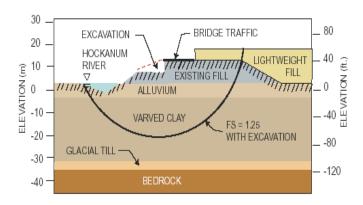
Slope stability for east abutment. Final conditions with lightweight fill
